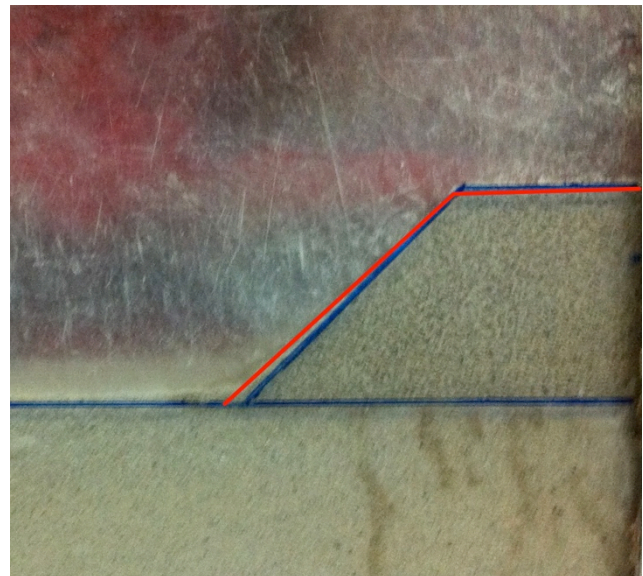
Deformation behavior of model IV (reinforced embankment on stiff foundation)
